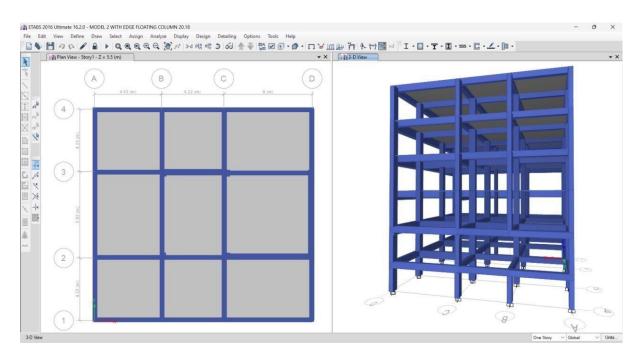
Model 2 - Plan & 3D view of Building with edge floating column from story 1
